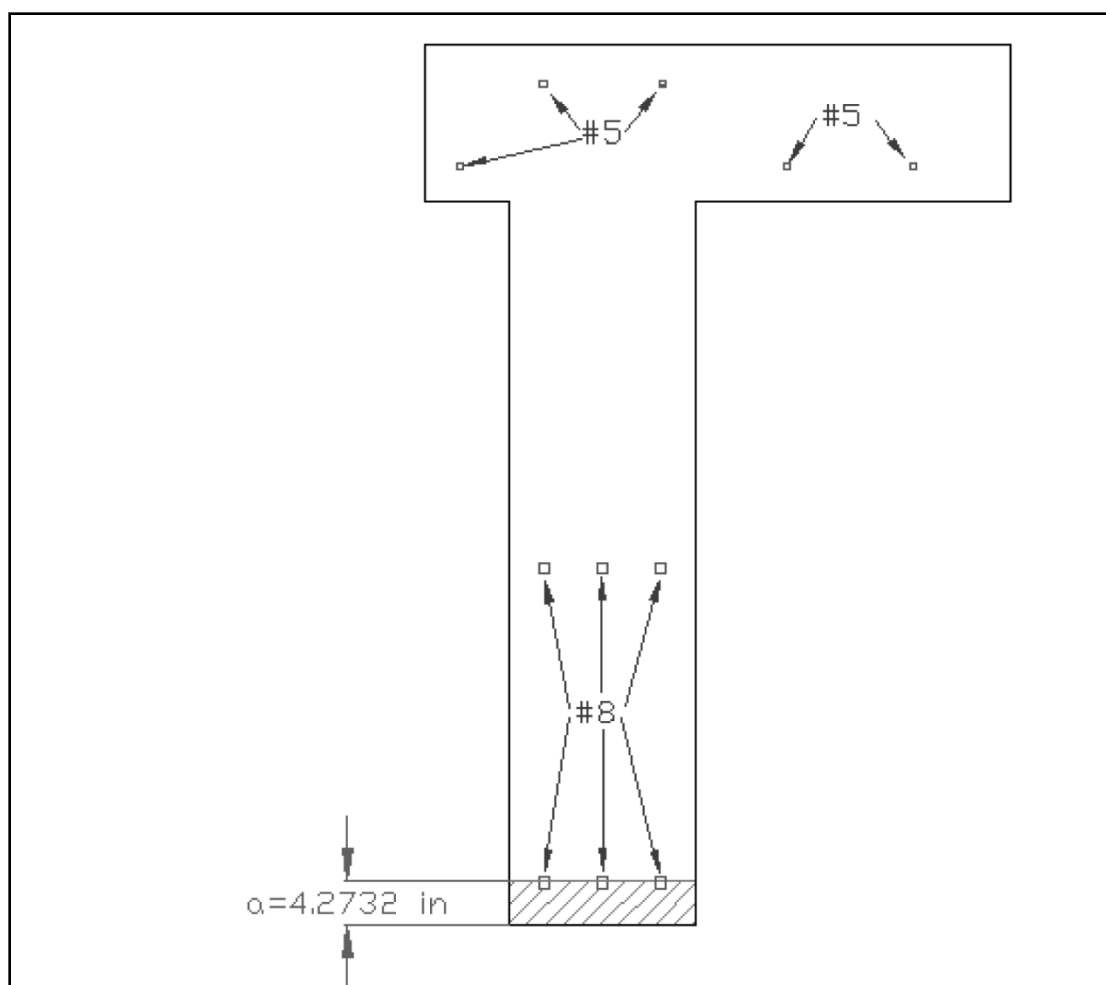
Cross section of the exterior beam at end-span with the steel rebars.
